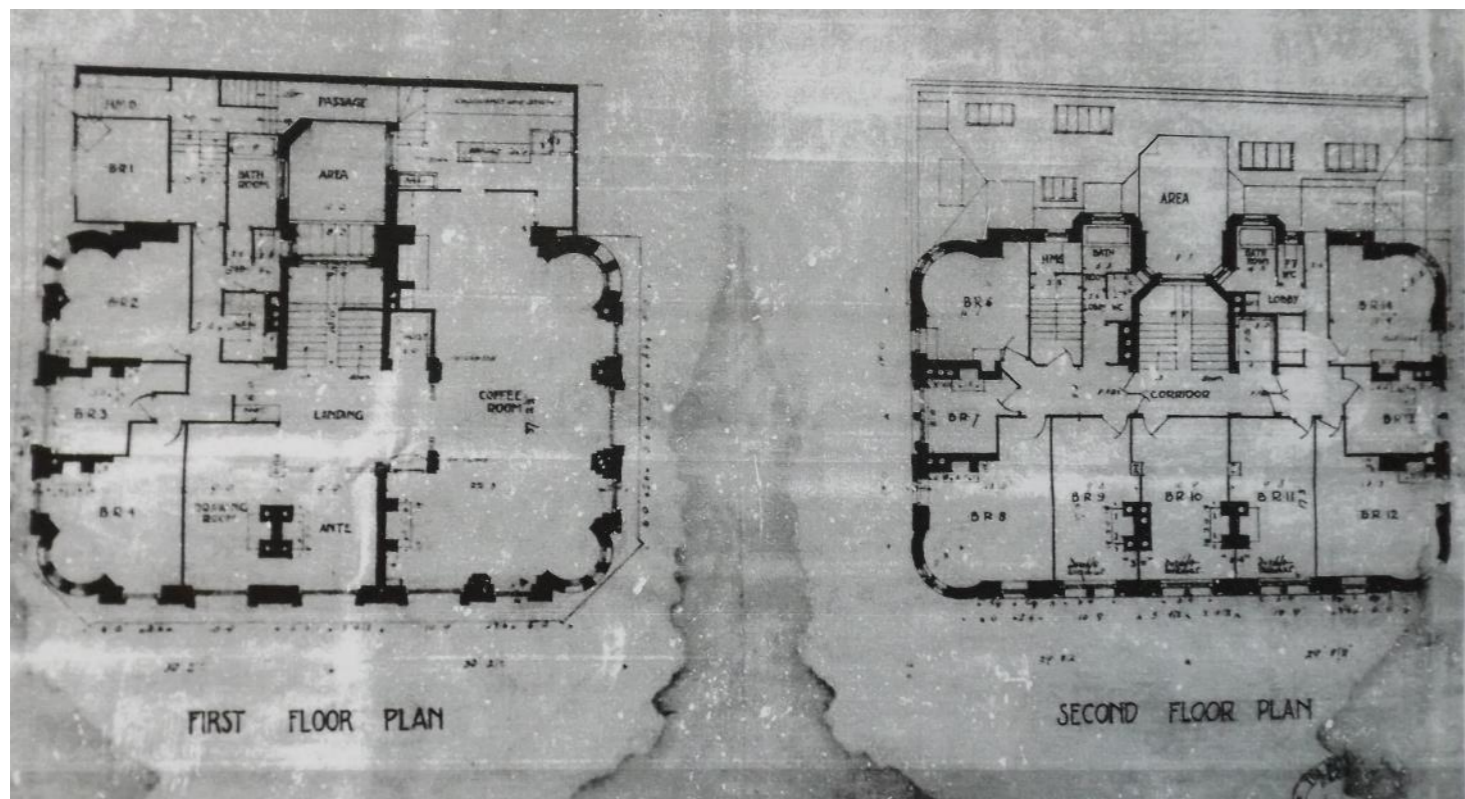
First and Second Floor Drainage plans of the newly constructed building (1905)
